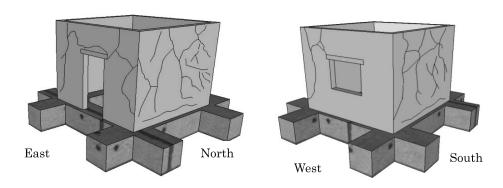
crack patterns of non-retrofitted building model after $42^{\rm nd}$ run
